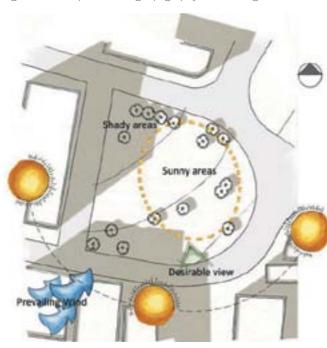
A site plan showing site characteristics (views, wind, sun and shade patterns, etc.).
